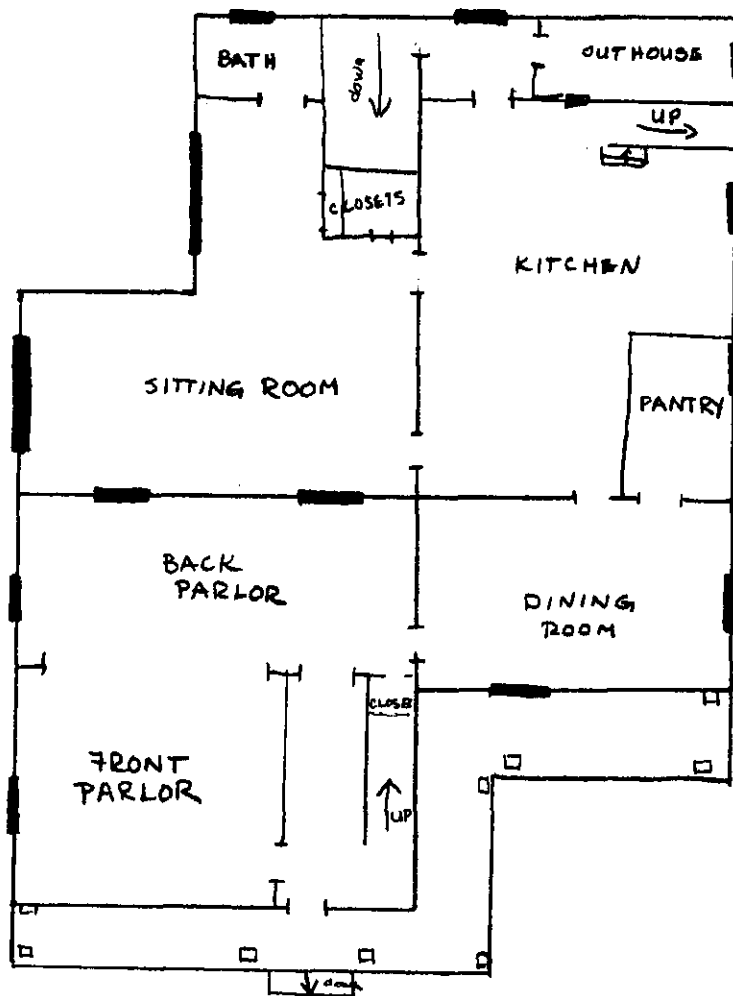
Floor plan of second floor. Drawing by author, 1975.
